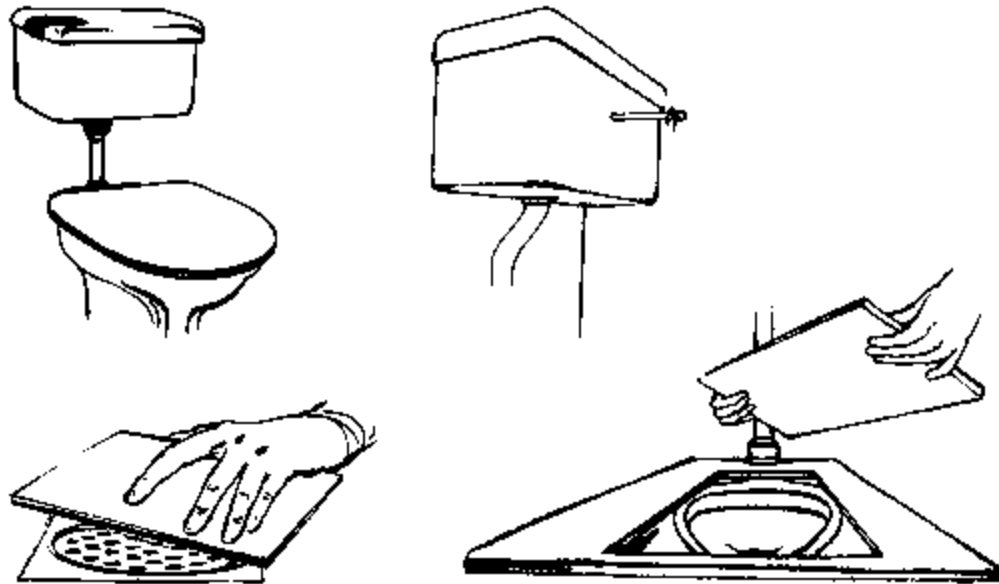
Toilet bowls, floor traps and overflow pipes should be made mosquito-proof.
